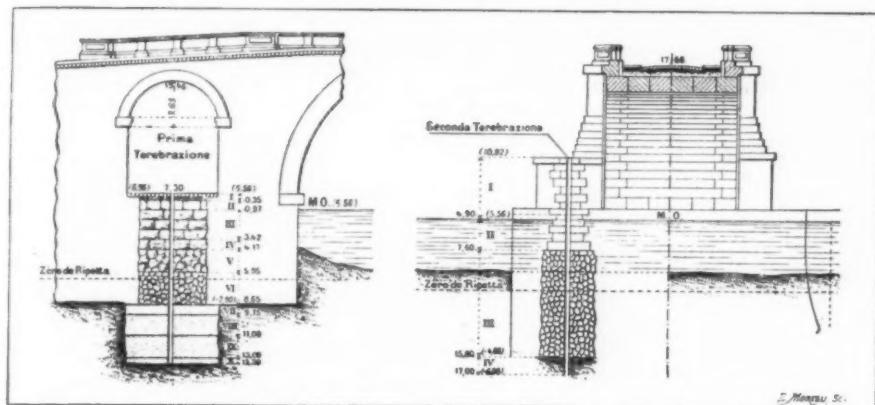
ÆLIUS BRIDGE—LEFT ABUTMENT AND FIRST PIER TO THE RIGHT.
